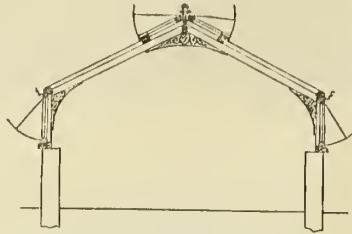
SPAN-ROOF HOUSE WITH SIDE LIGHTS.
